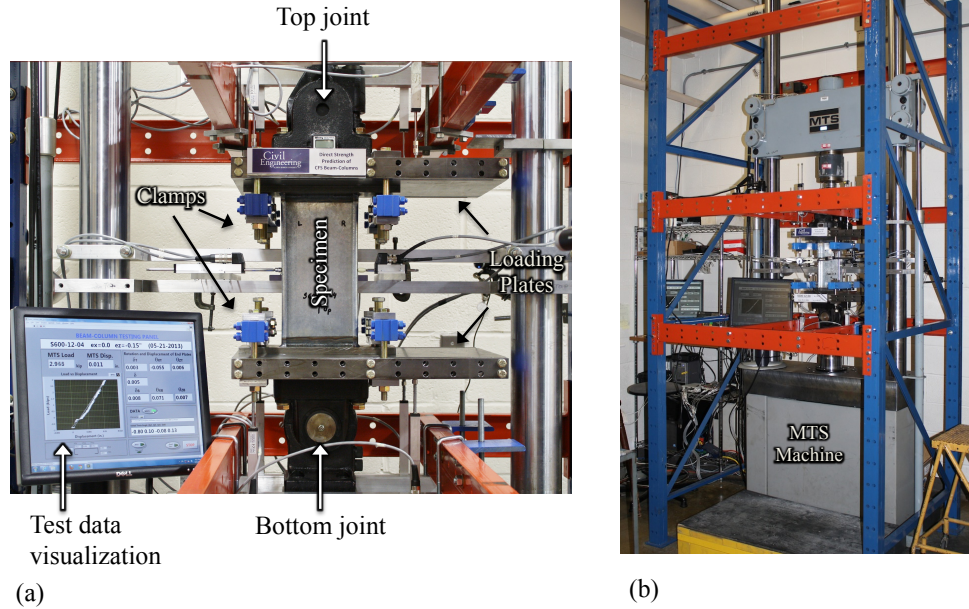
Test setup of the beam-column experimental program. (a) Loading plates and swivel joints, (b) Test specific facilities including MTS machine (100 kips), Frazier Rack and the test rig.
